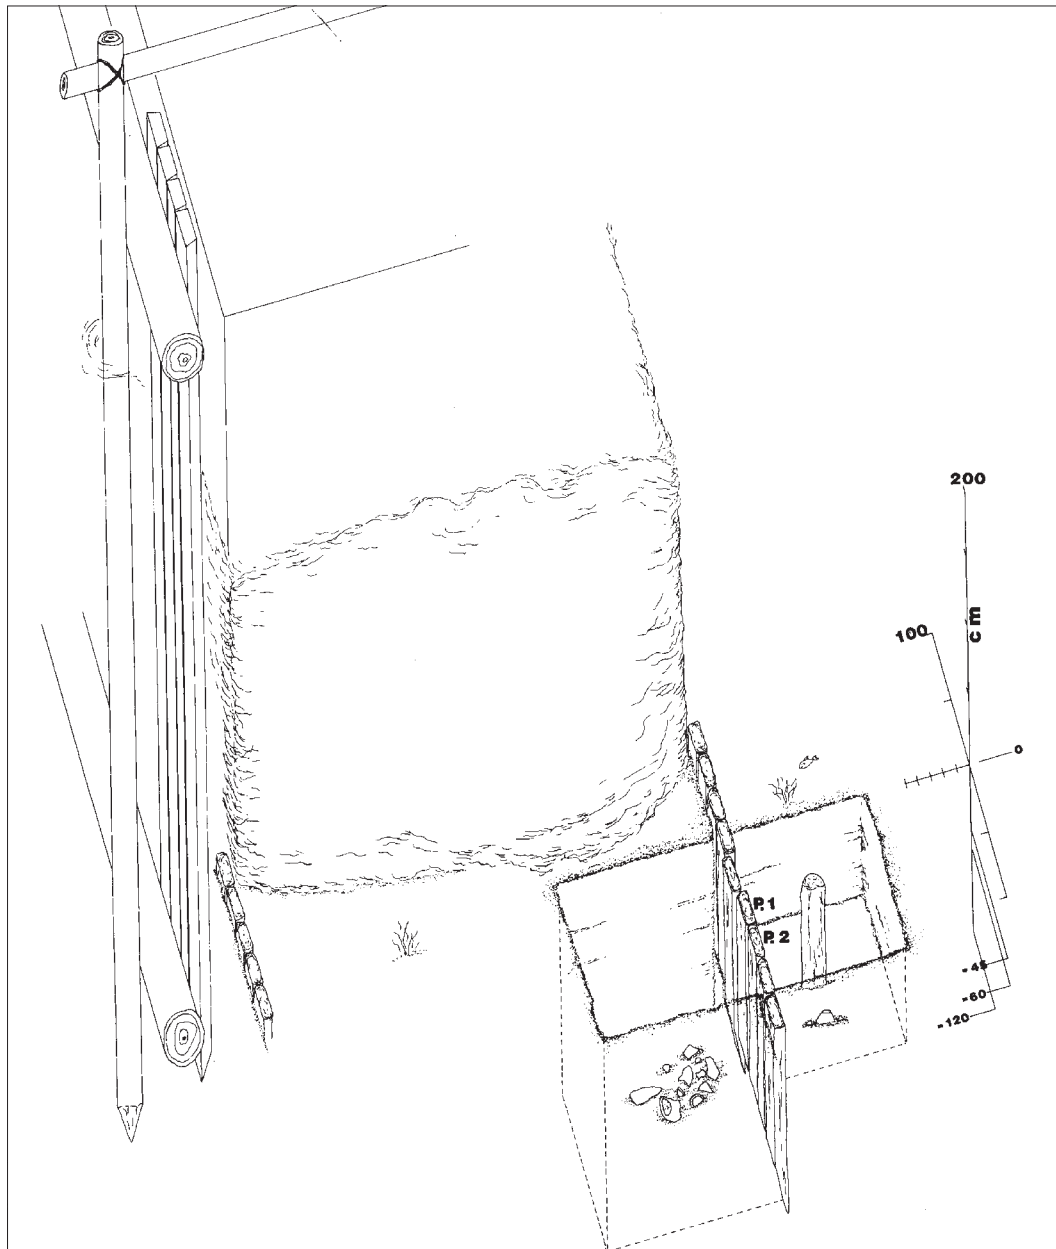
Reconstruction of the inner harbour concrete pier at Anzio (Felici 2002: fig. 8; used with permission).
